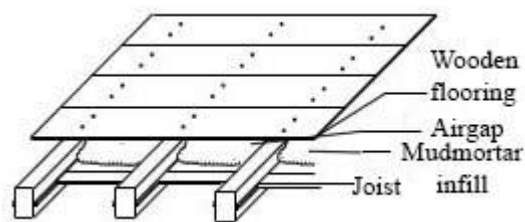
Floor details of houses in Safranbolu (Eraslan, 2009, pp 47).
